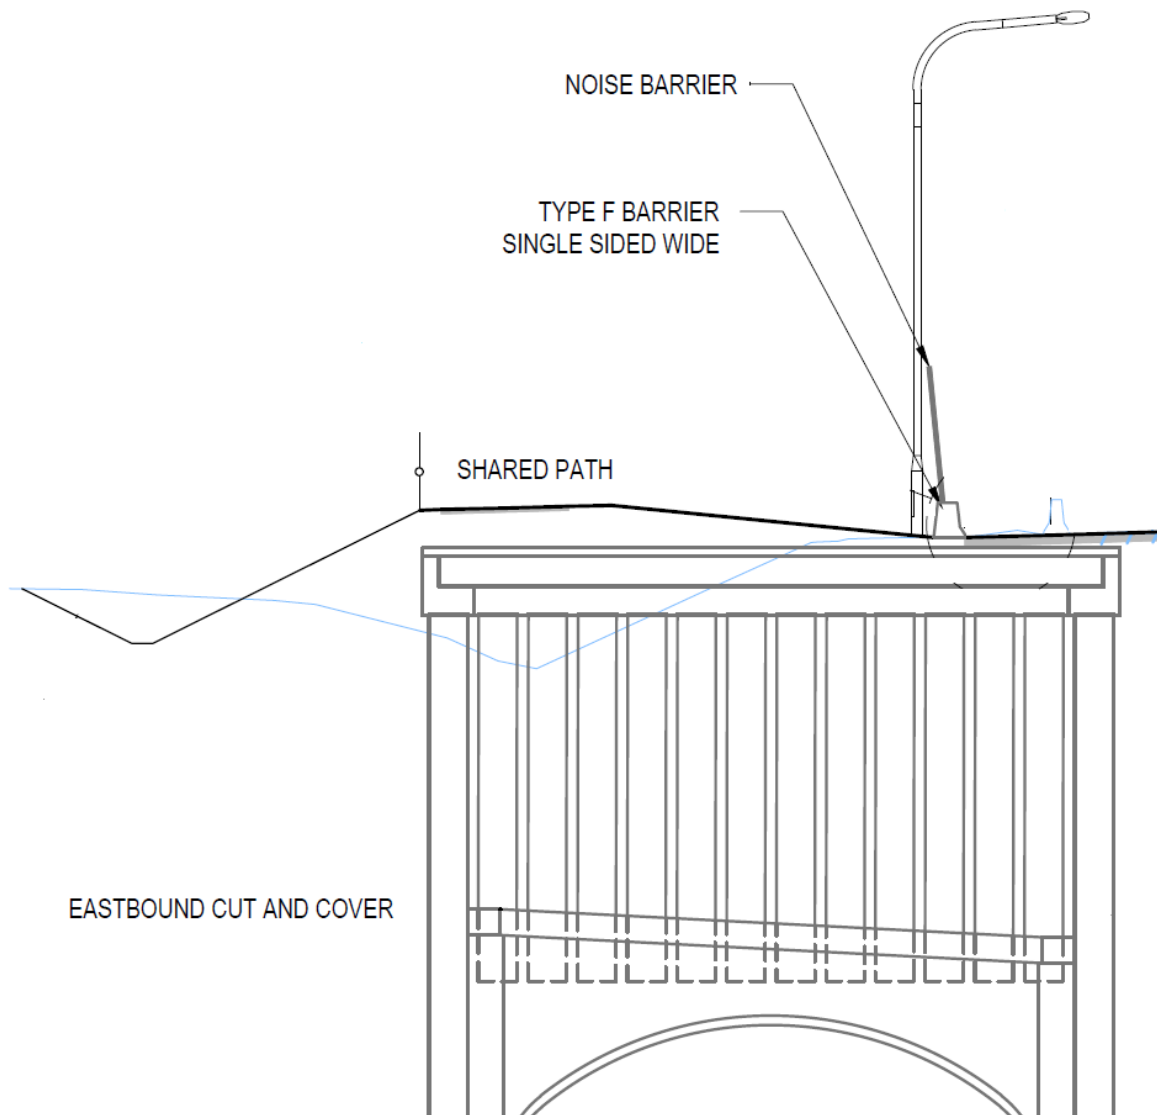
Noise Wall 3 (Figure 1 cross section – NW3 – XS3)
